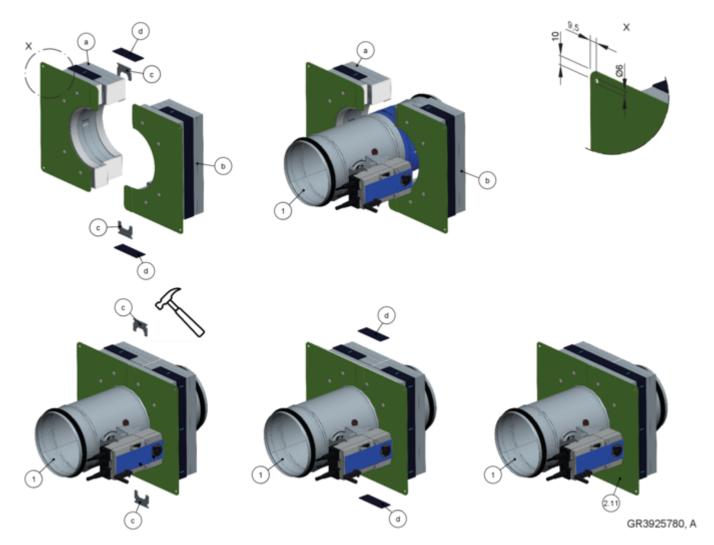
Supply package and installation of installation kit TQ2 for dry mortarless installation
